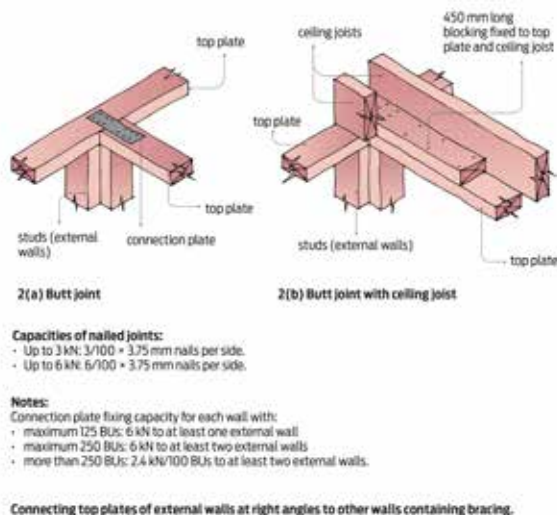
Connection top plates of external walls at right angles to other walls containing bracing. Image supplied by BRANZ/Build magazine.
